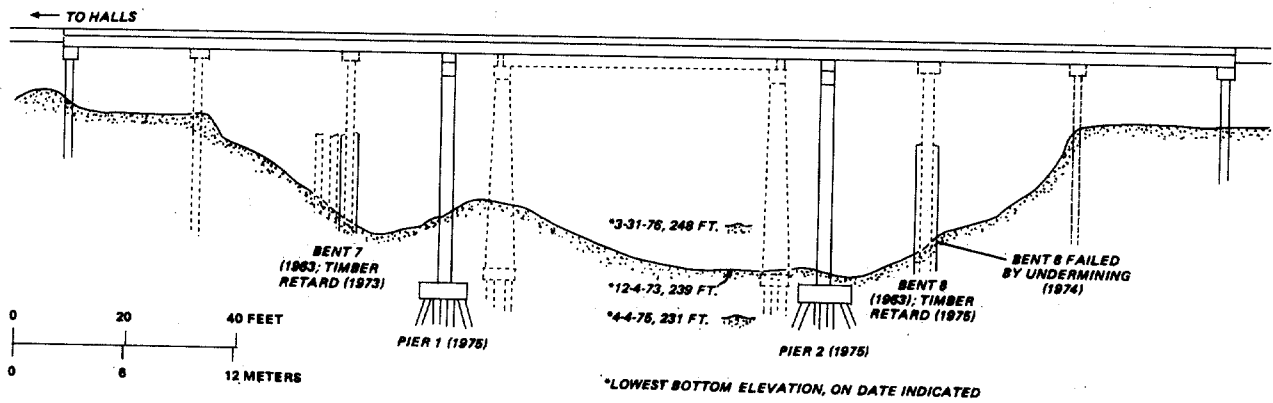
Elevation sketch of US-51 bridge. Piers and pile bents of 1963 bridge, removed during construction of 1975 bridge, are shown in dashed lines.
